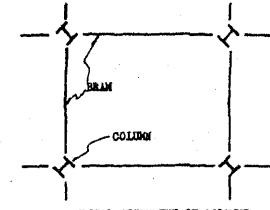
TYPICAL ALIGNMENT OF COLUMNS
